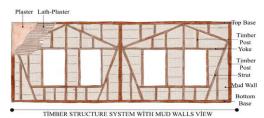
The timber frame wall system filled with adobe material. The inventory number of the traditional house is 154.
